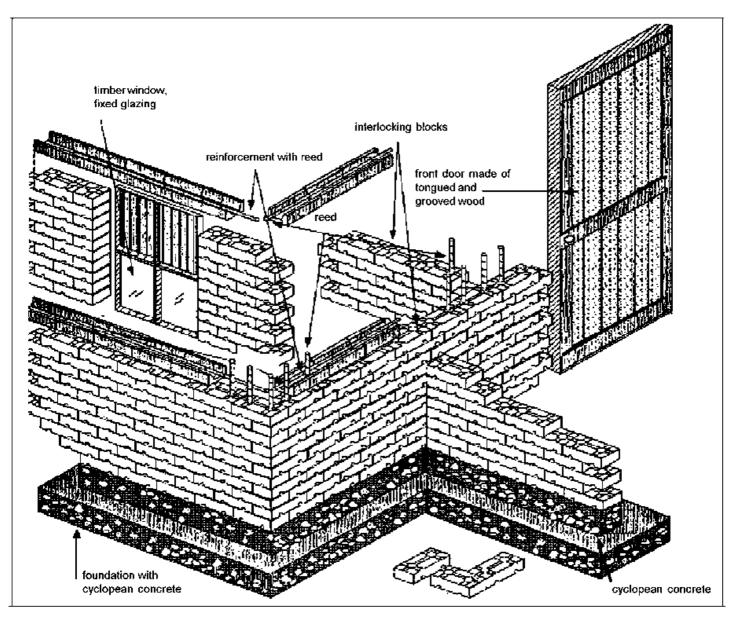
shows a similar system, developed by the University of the Andes, Mérida, Venezuela. The blocks have grooves and tongues which interlock. Horizontal ring beams of reinforced concrete are placed at a height of 1.20 m and on top of the wall.
